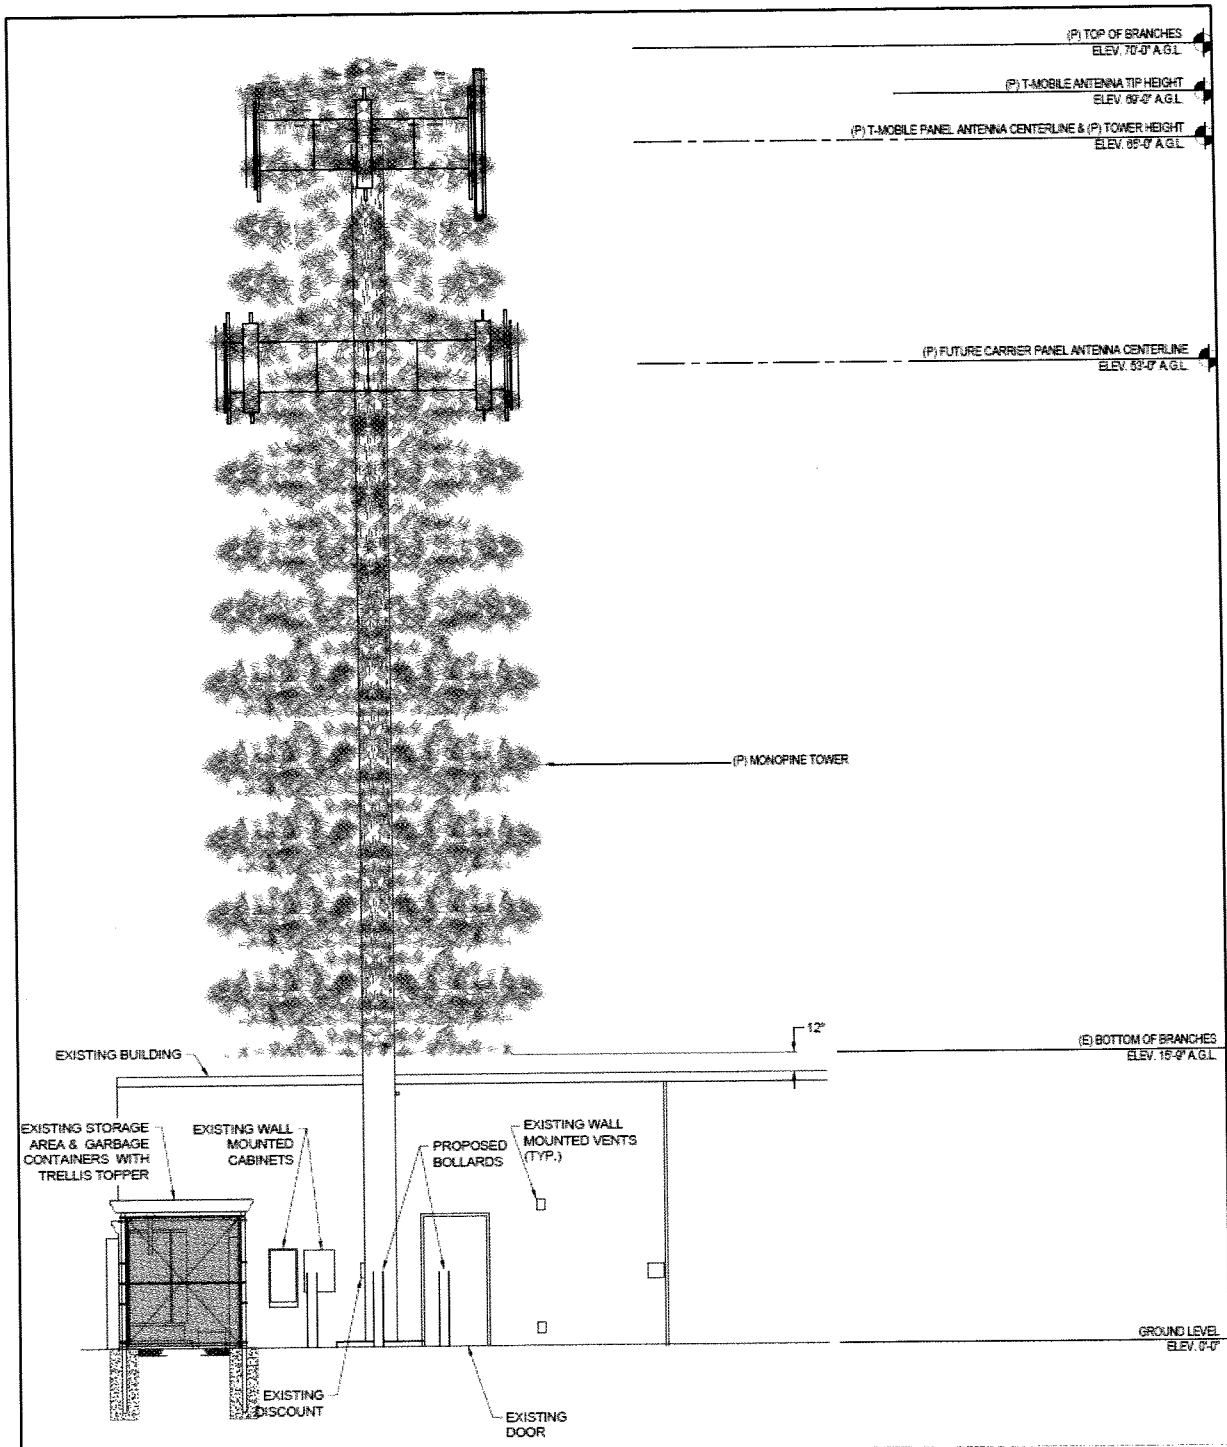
Elevation view of T-Mobile proposal (Source: Plans, page A-4, panel 1). Note that the Plans show portions of the antennas extending outwards past the ends of the faux branches.
